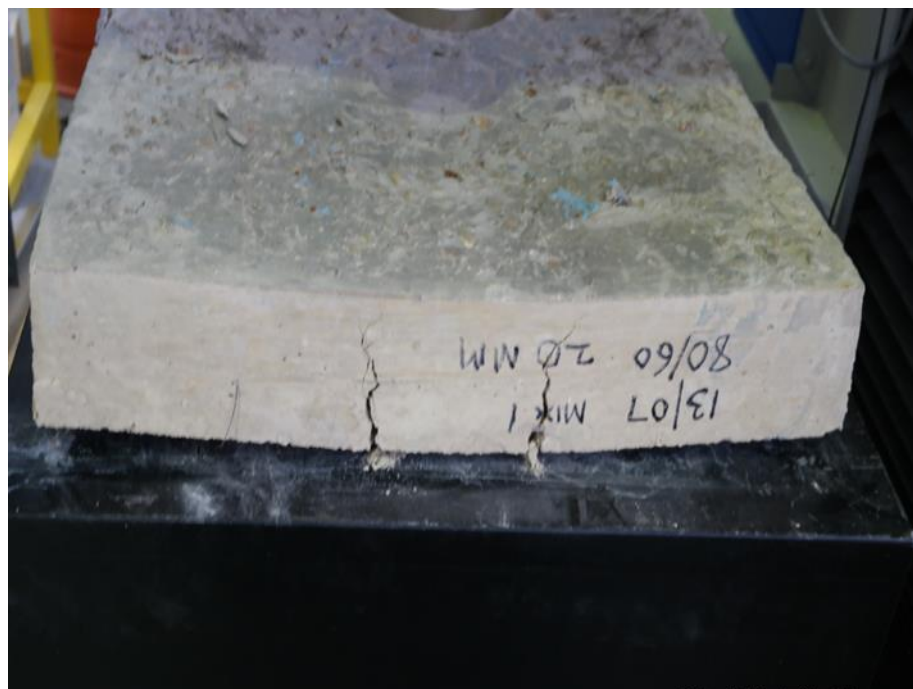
Mode of cracking on side and surface of slab 20 mm + 80/60 at testing position
